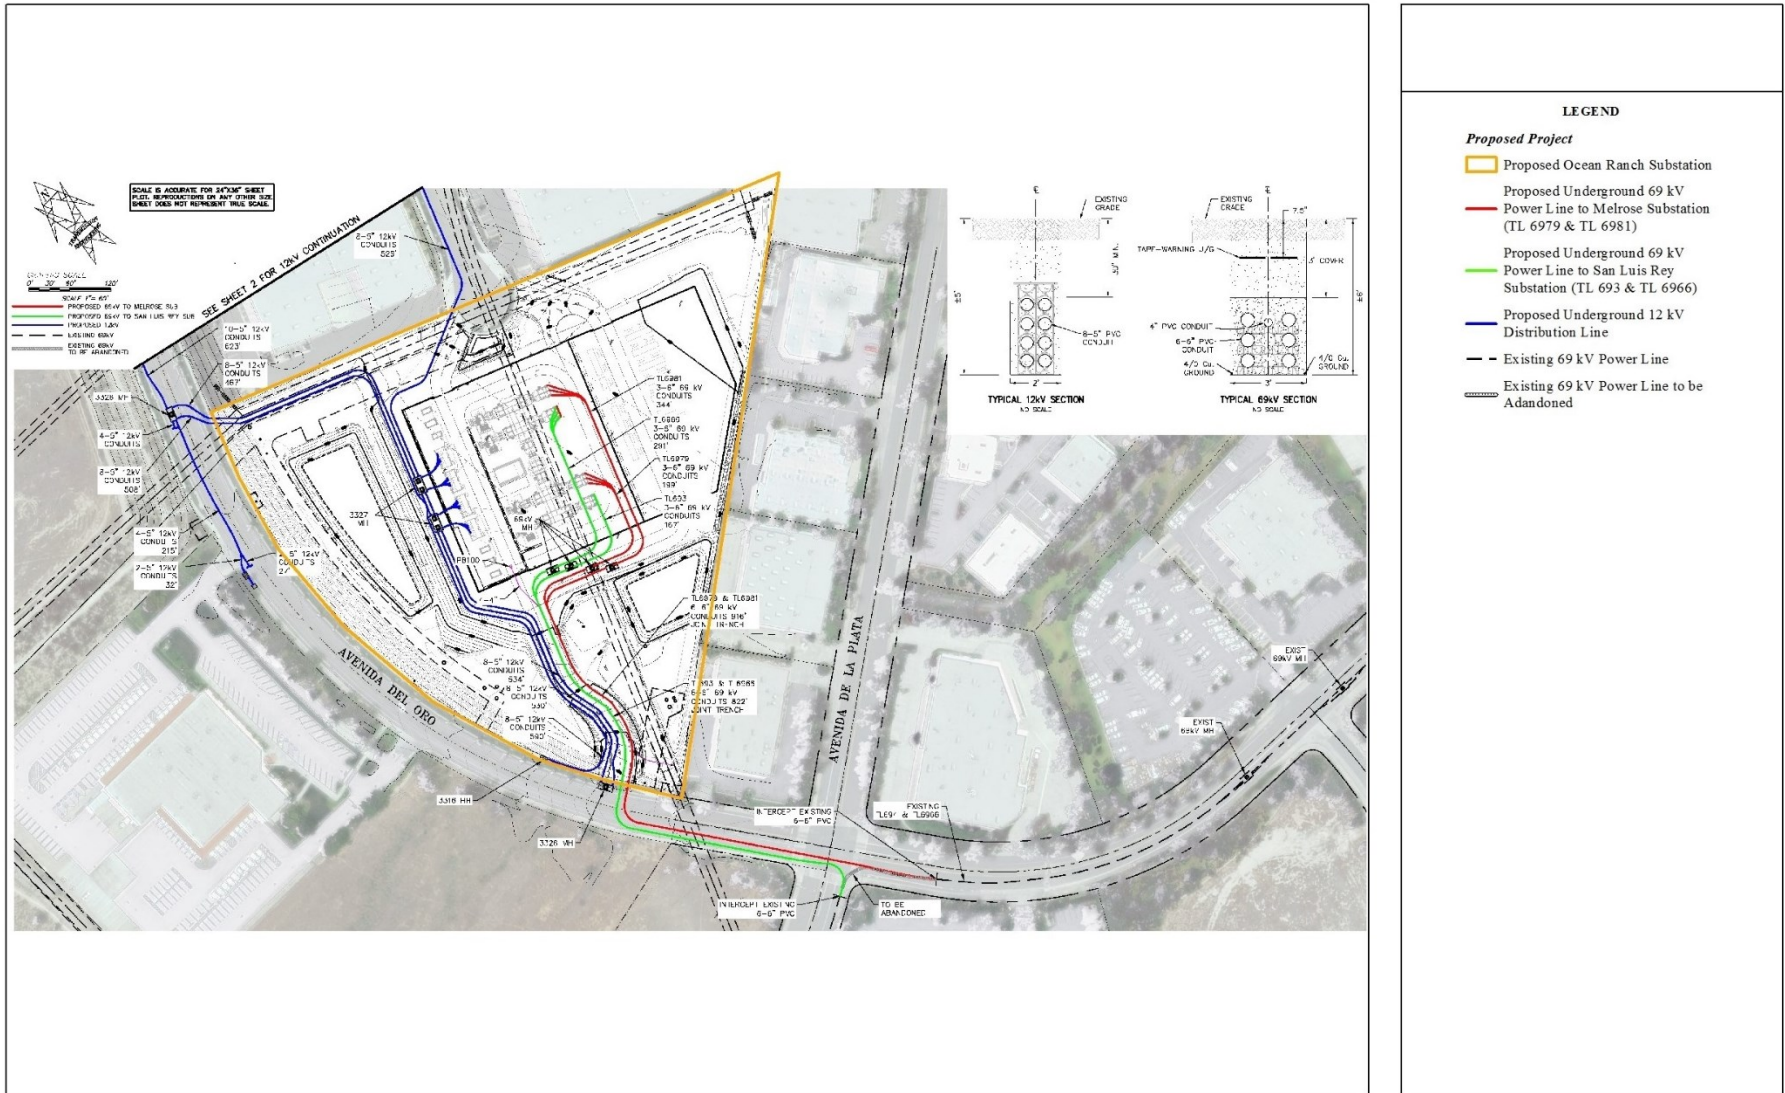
Proposed Ocean Ranch Substation Ultimate Layout
